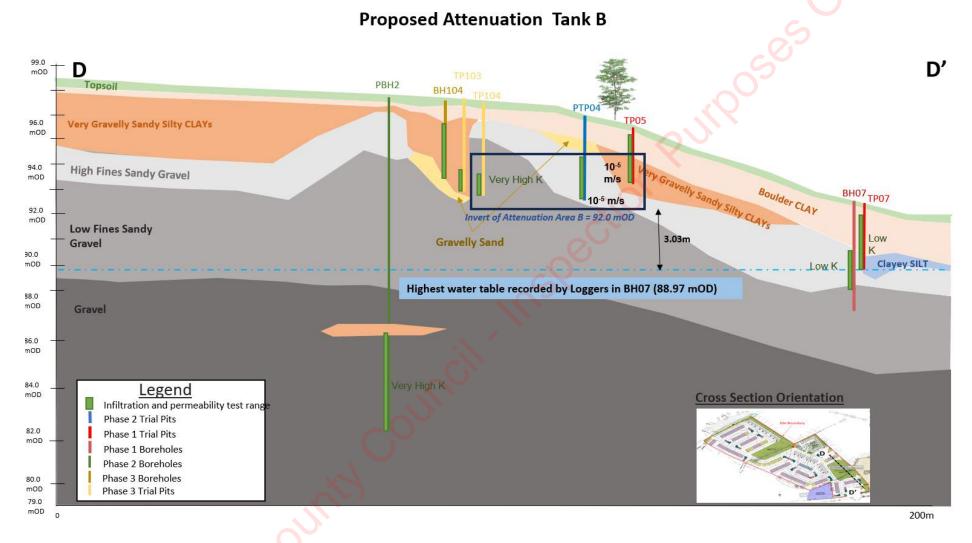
Proposed Attenuation Tank B Cross Section (D – D')
